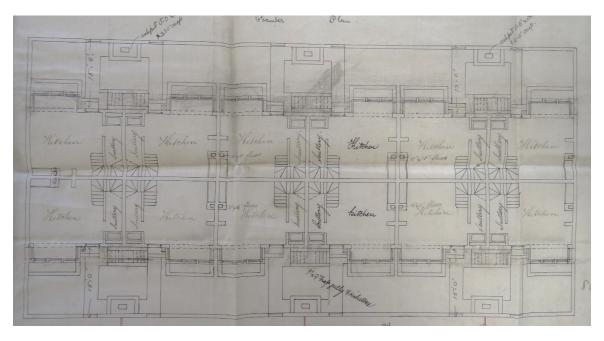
Ground floor plans show a layout for the scullery and stairs that was not implemented. The actual design follows a layout similar to the majority of houses in the area (Dodgson 1888).
